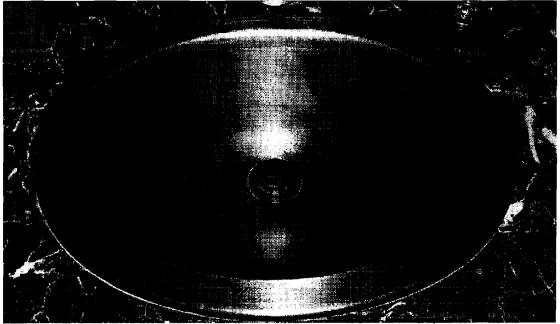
Photograph of pitting on sink in the first floor guest bedroom.
